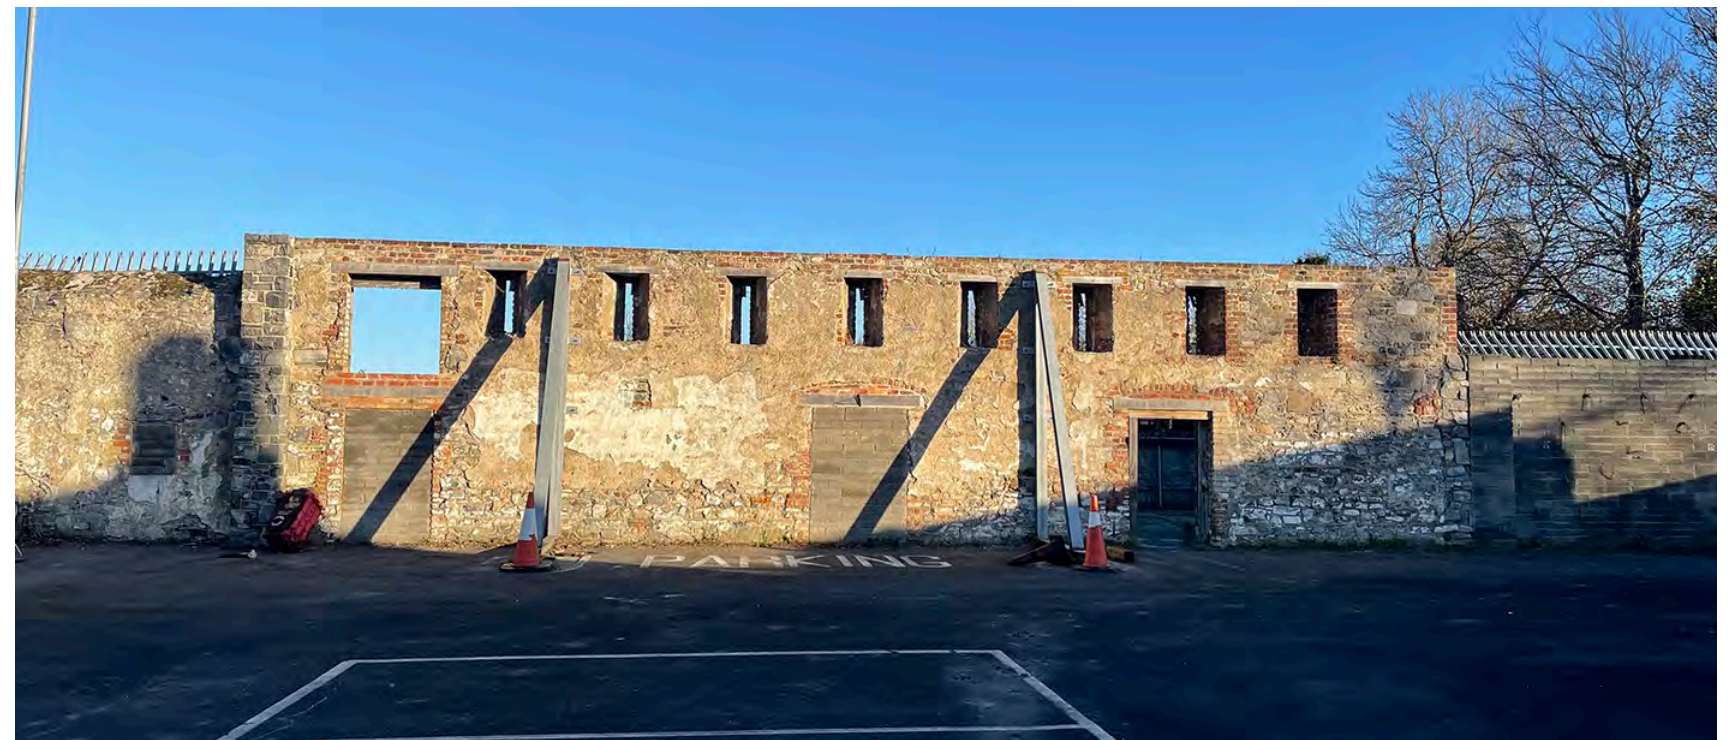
View of Wall C from Courtyard 3, remaining facade acting as wall between courtyards
